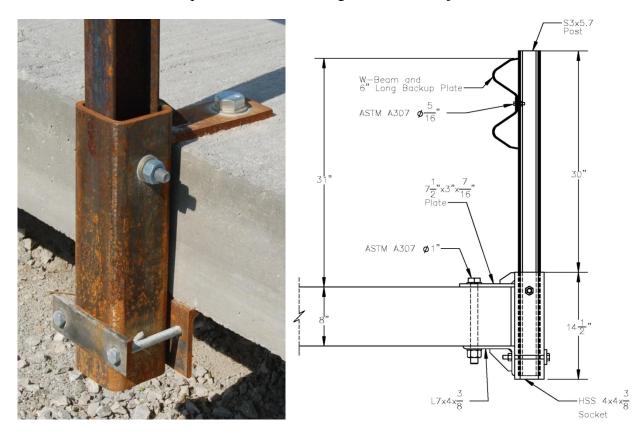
Weak-Post, MGS Bridge Rail attached to Concrete Deck [13-14].
